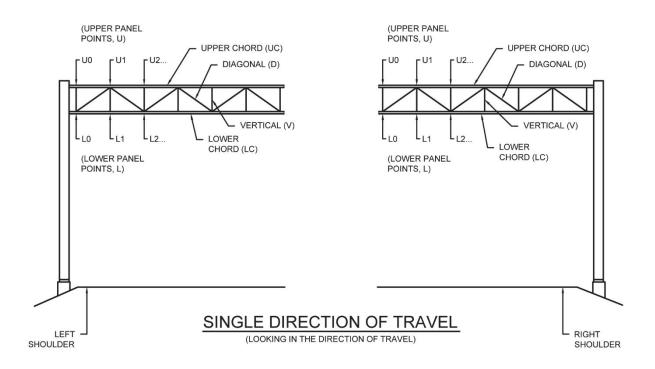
Methodology for Panel Point Numbering and Component Labeling of Cantilever (Two Chord and Four Chord Truss) Sign Structures
